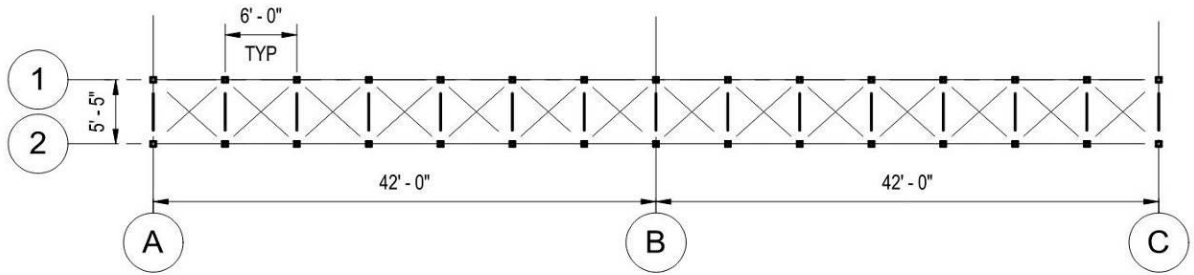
TRUSS BRIDGE PLAN, SPAN 84'
